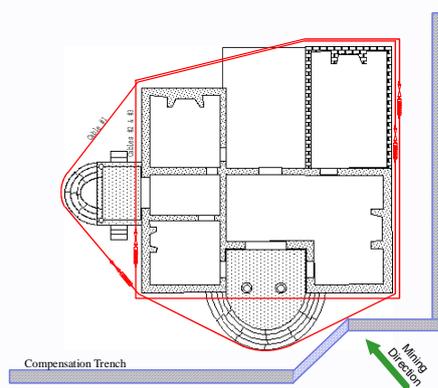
Mitigation Measures for a Historic House Located over the Central Portion of a Longwall Panel
